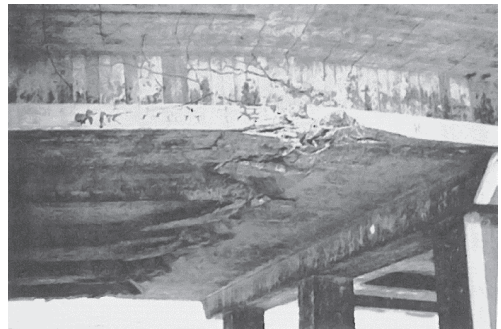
The Tingstad Bridge after failure of the girder at the intermediate support (Bådholm et al. 1967a).
